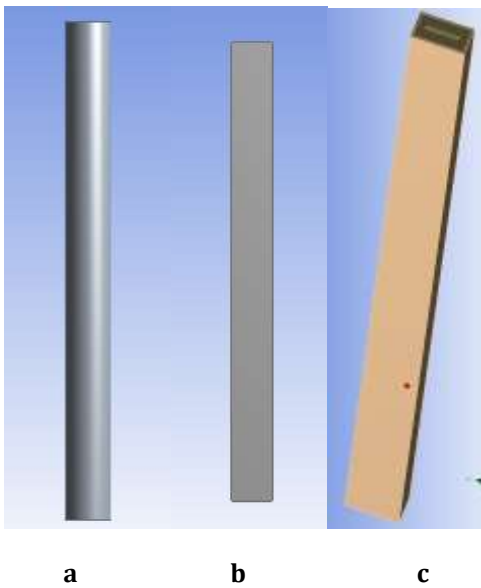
Cross section of columns (a) circular column (b) square column (c) rectangular column.
